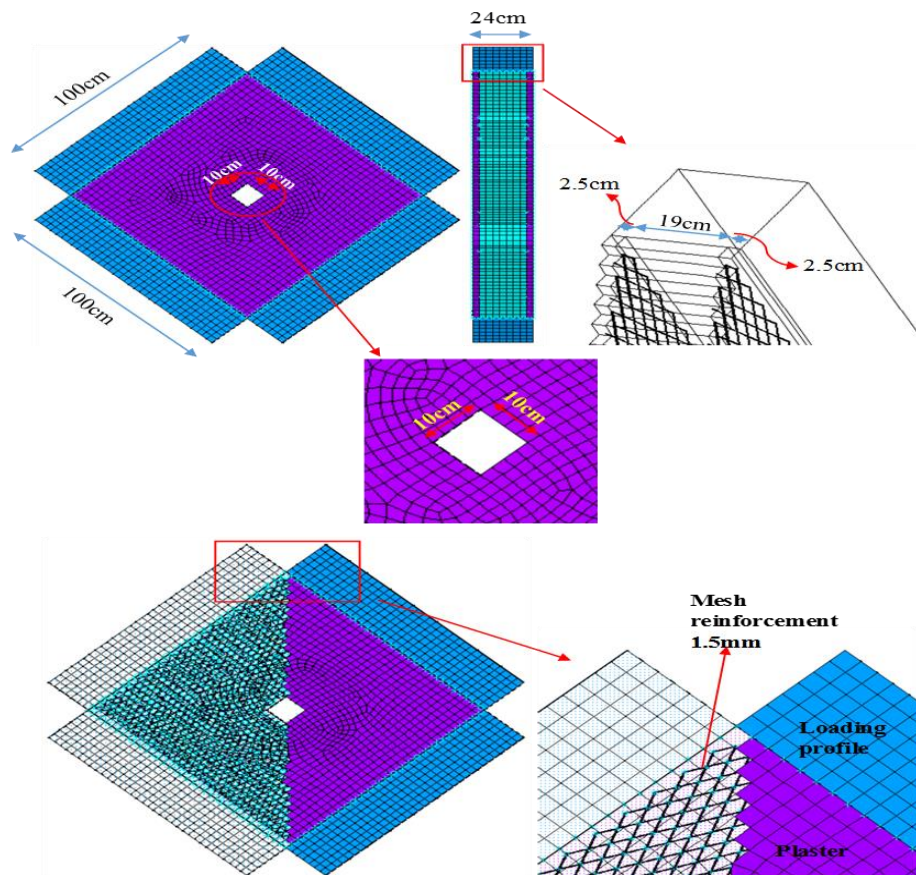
10% opening ratio of the masonry wall model-1.5mm mesh reinforcement
